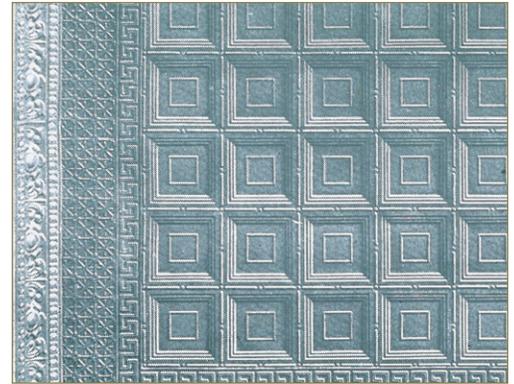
Pressed metal ceiling manufactured by F.W. Norman.
